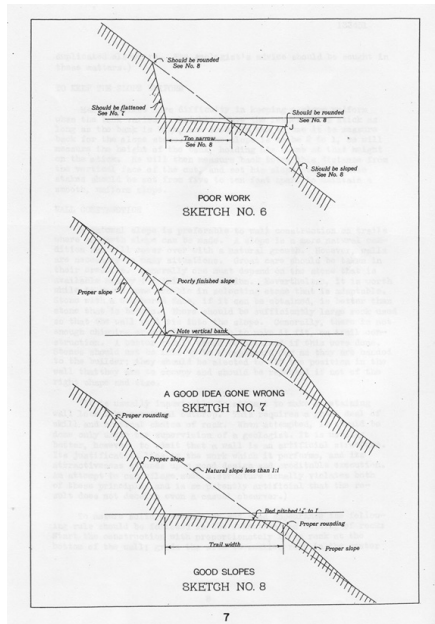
U.S. Department of the Interior 1937 manual, *Construction of Trails*, used by the CCC. Diagram illustrates the proper construction of bench cuts for side-hill trails. (Shenandoah NP Archives)
